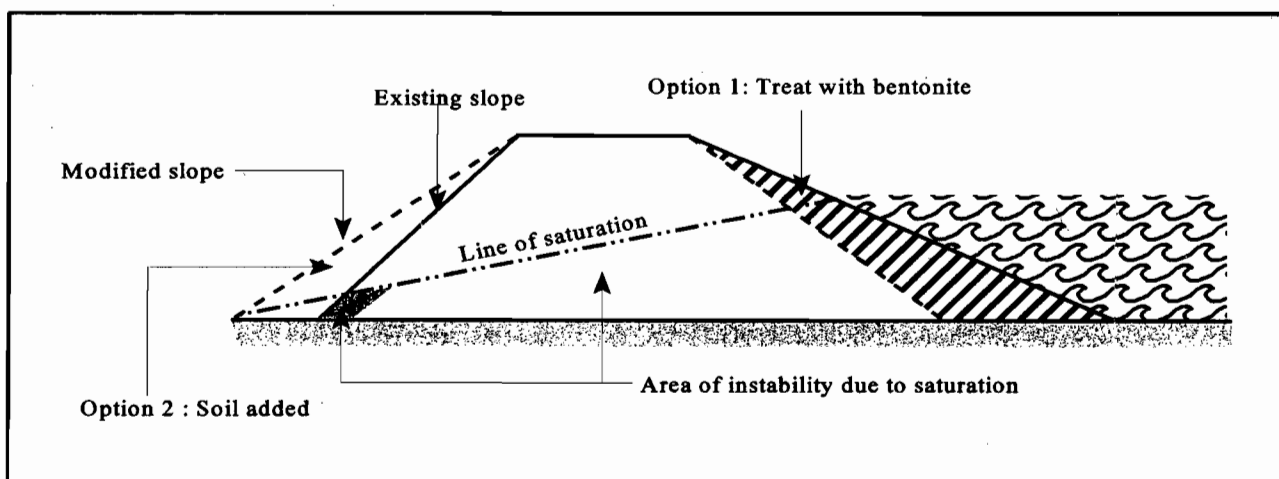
Cross section through dam wall showing how too steep a side slope can cause instability
